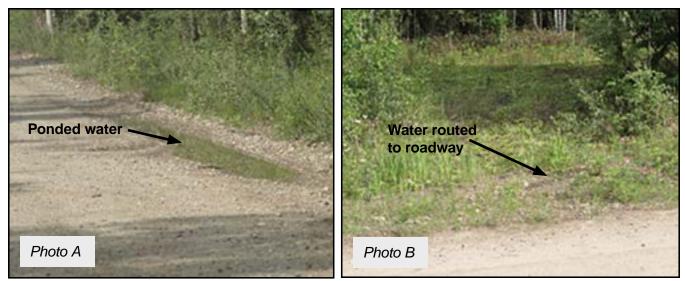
Photo A shows ponding due to improper ditching and Photo B shows a ditch blocked by poor maintenance.
